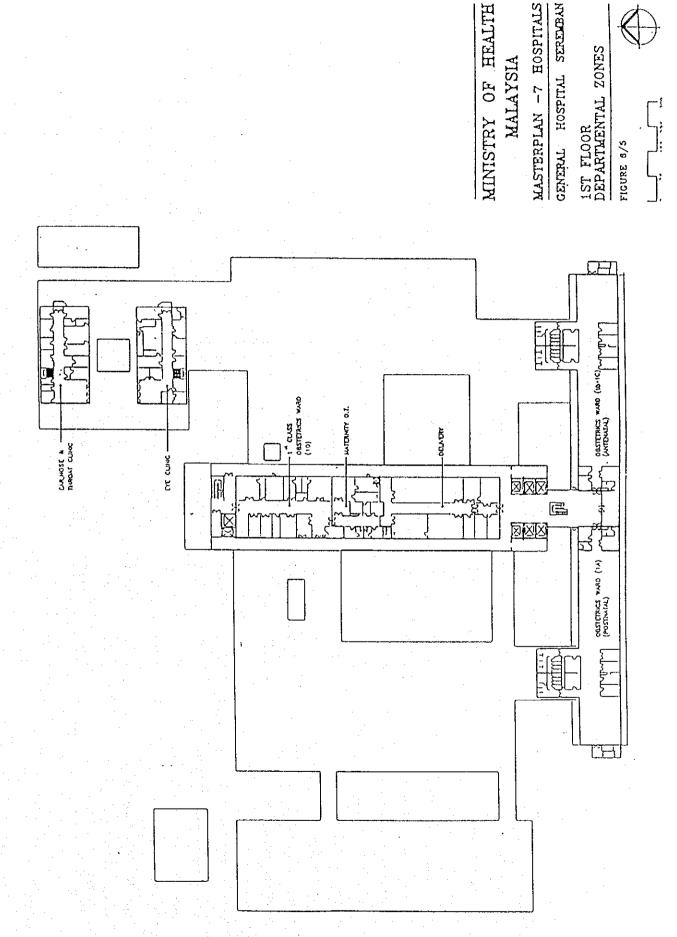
Layout of the Hospital (1st Floor: similar to the 2nd - 8th Floors)
